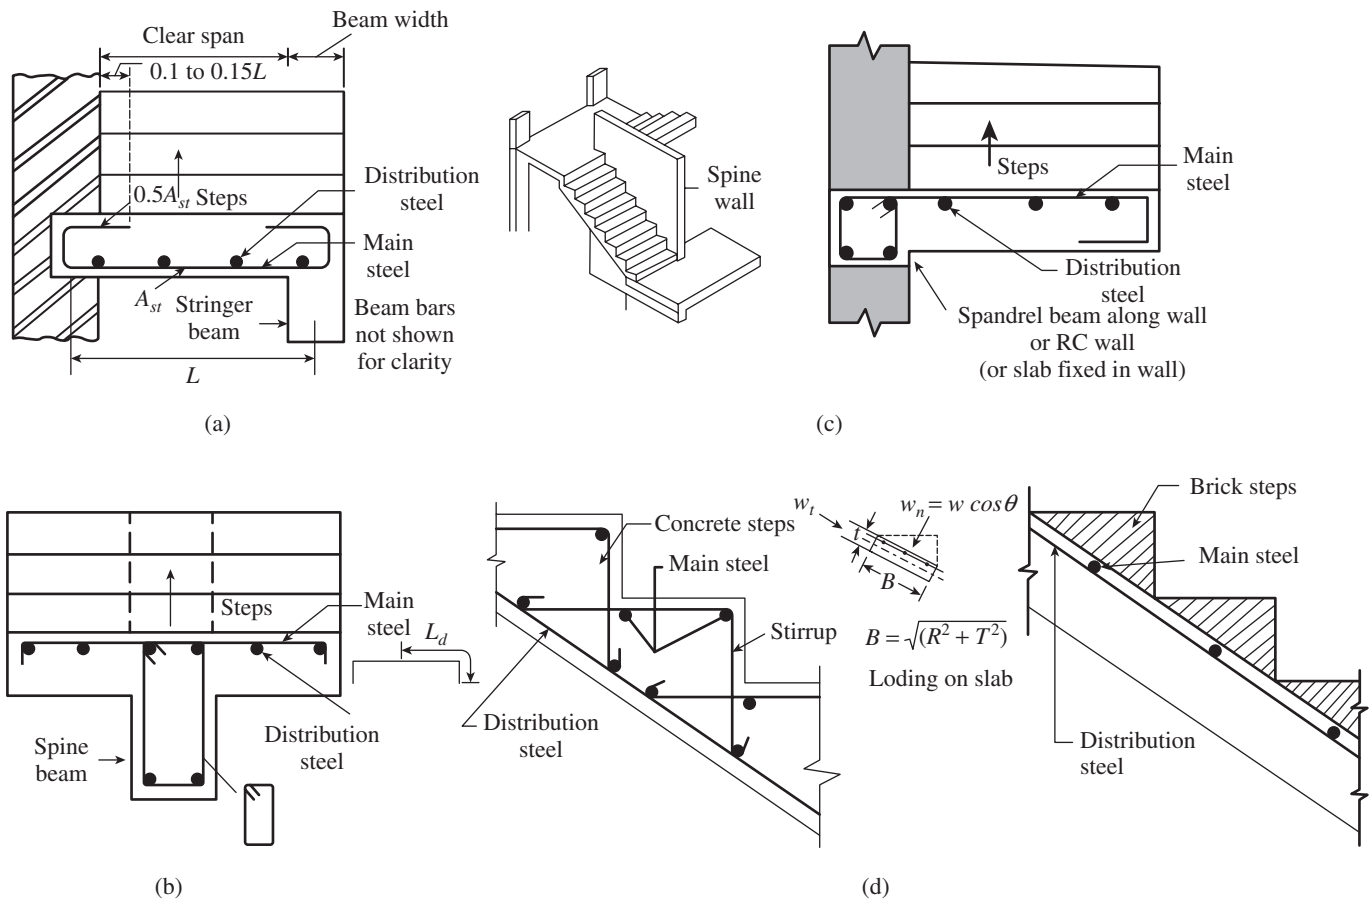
Transversely supported stairs (a) Supported between two stringer beams or walls (b) Doubly cantilevered from a central spine beam (c) Cantilevered from spandrel beam or wall (d) Detailing of cantilever stair for concrete and brick steps
